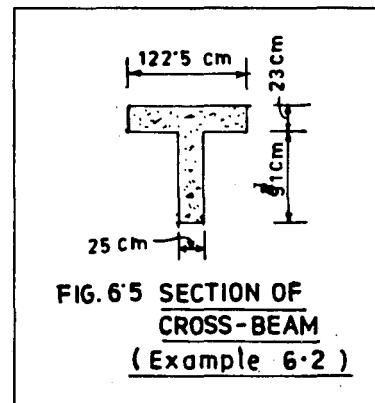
SECTION OF CROSS-BEAM (Example 6.2)
